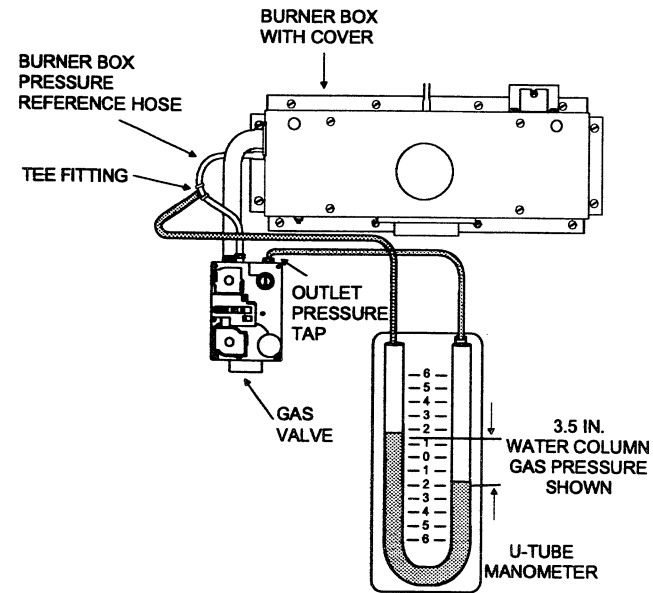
READING GAS PRESSURE WITH BURNER BOX COVER IN PLACE
